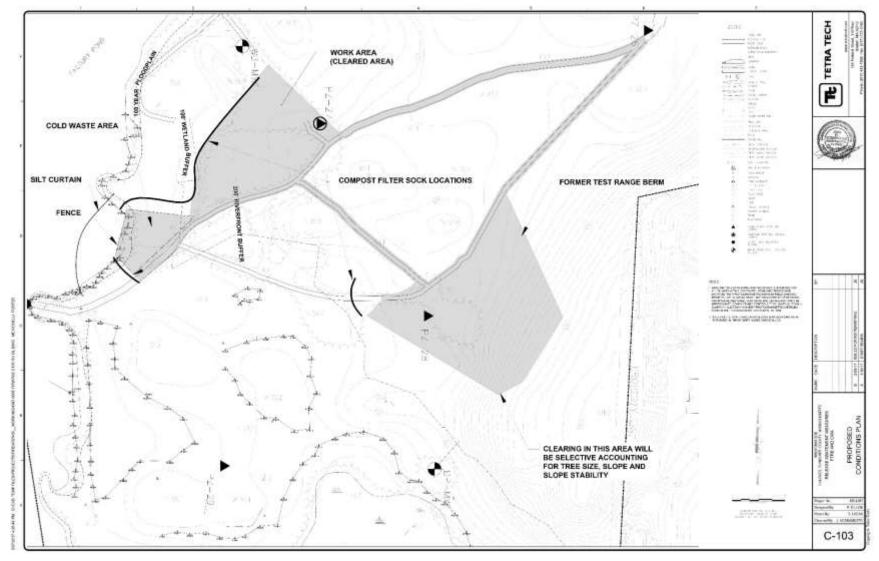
Proposed Conditions Plan for the RAM Work Area
